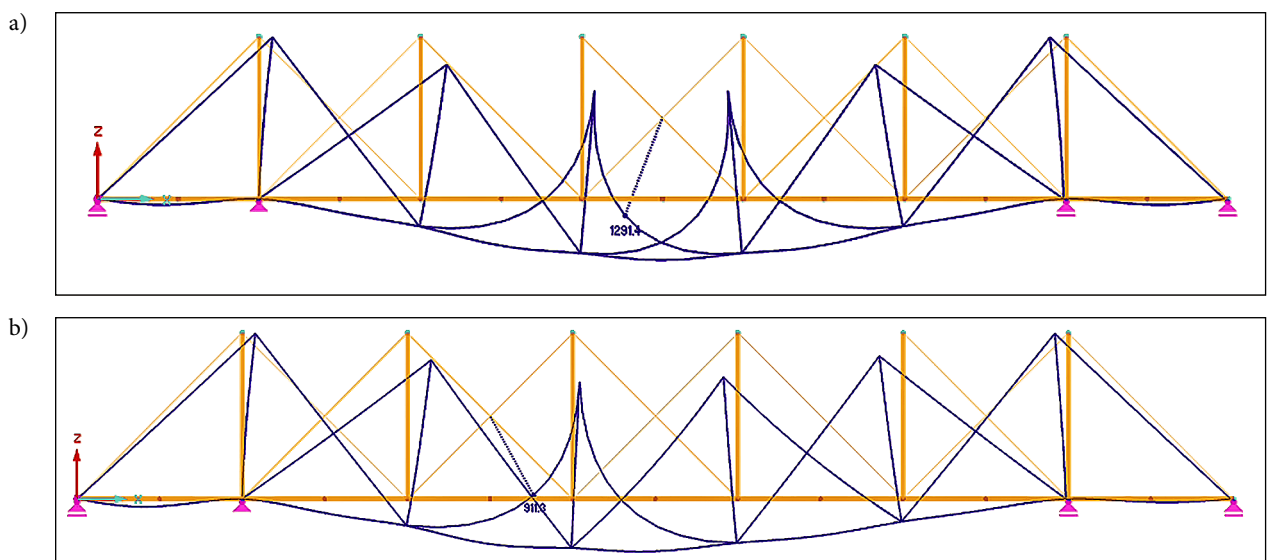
Equal pylons bridge. Deflections: a) under symmetrical loading; b) under asymmetrical loading
